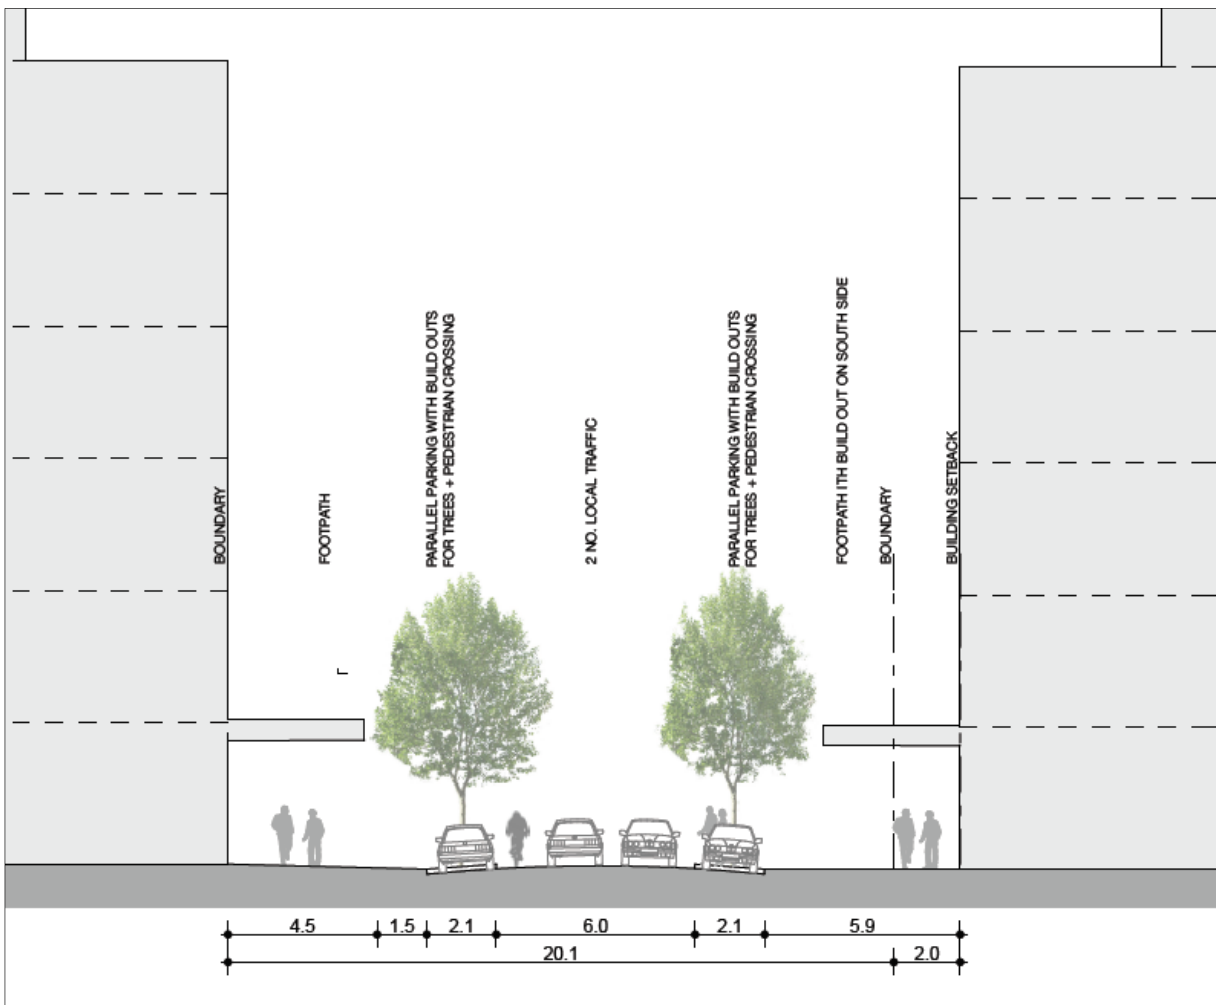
Proposed Huron Street Cross Section (Indicative) – Looking East⁵¹
